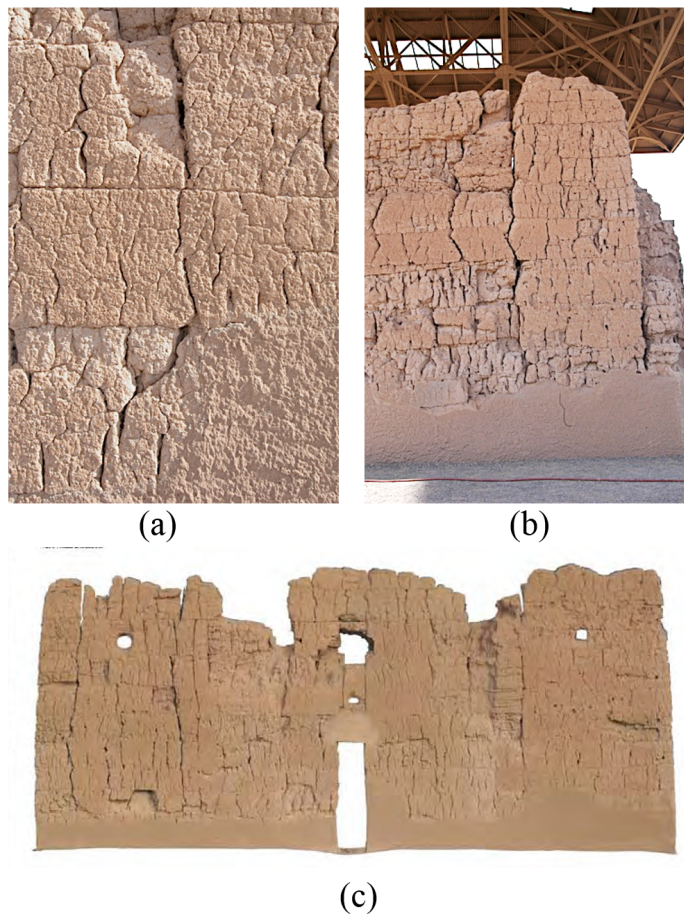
East perimeter wall showing (a) horizontal coursing and (b) large vertical cracks; (c) west perimeter wall displaying similar vertical cracking behaviour (adapted from Porter et al. (2018))
